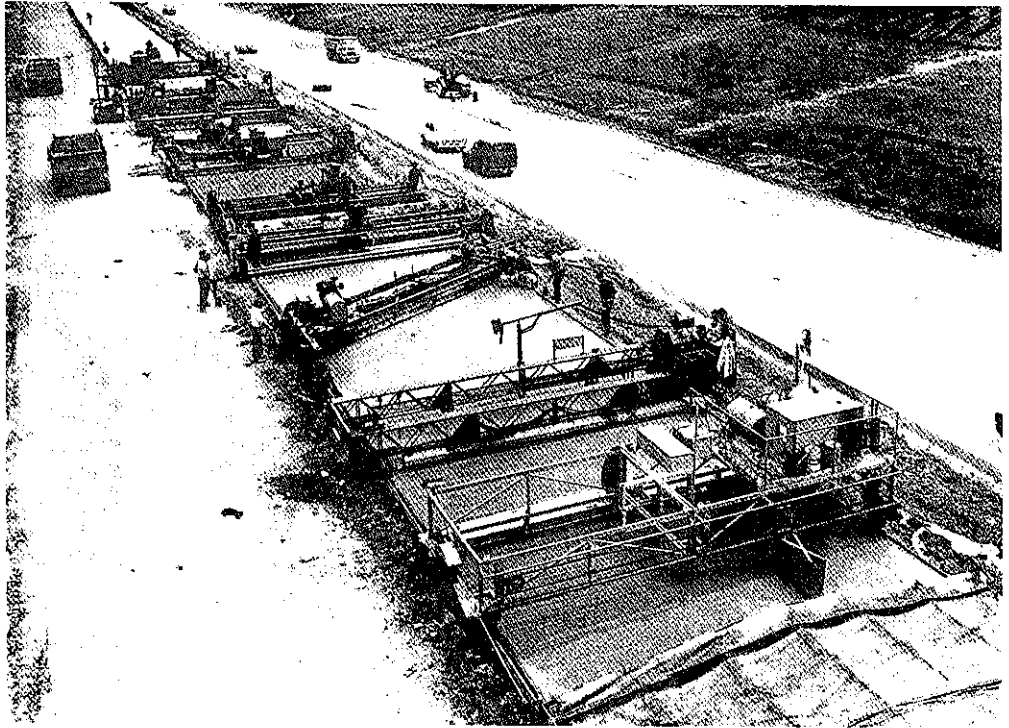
Spreading, compacting and finishing concrete pavements by machine.
